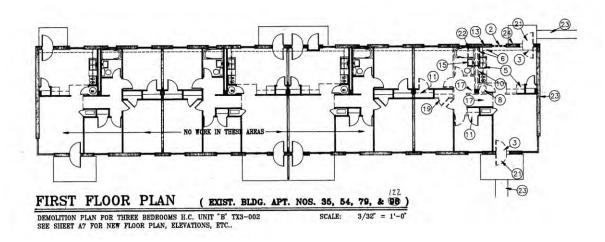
This is a typical Type B building first floor plan. Accessibility Alterations for Tays Complex – TX3-002 / TX3-003 / TX3-015A; sheet number A1 – Demolition Plans, dated March 1993. Courtesy of HACEP.
